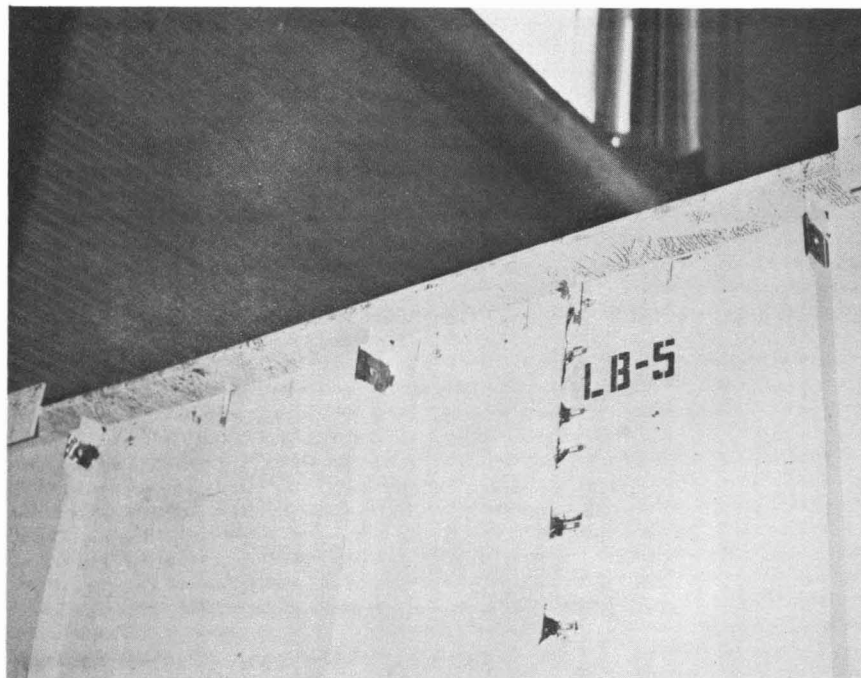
Yield Pattern, Far Side (Specimen LB5)
